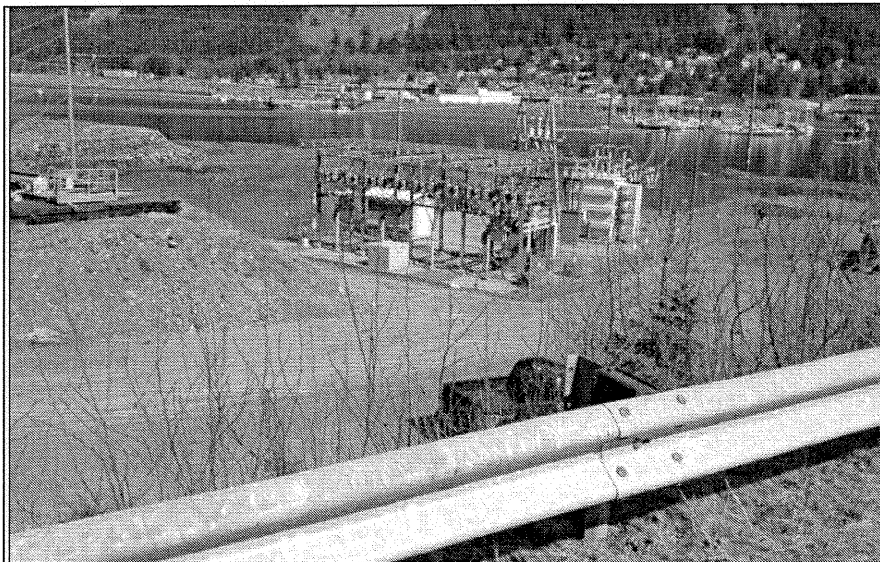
Picture taken from the Juneau-Douglas Bridge hillside looking down toward the electrical substation. Picture taken 4-29-13.
